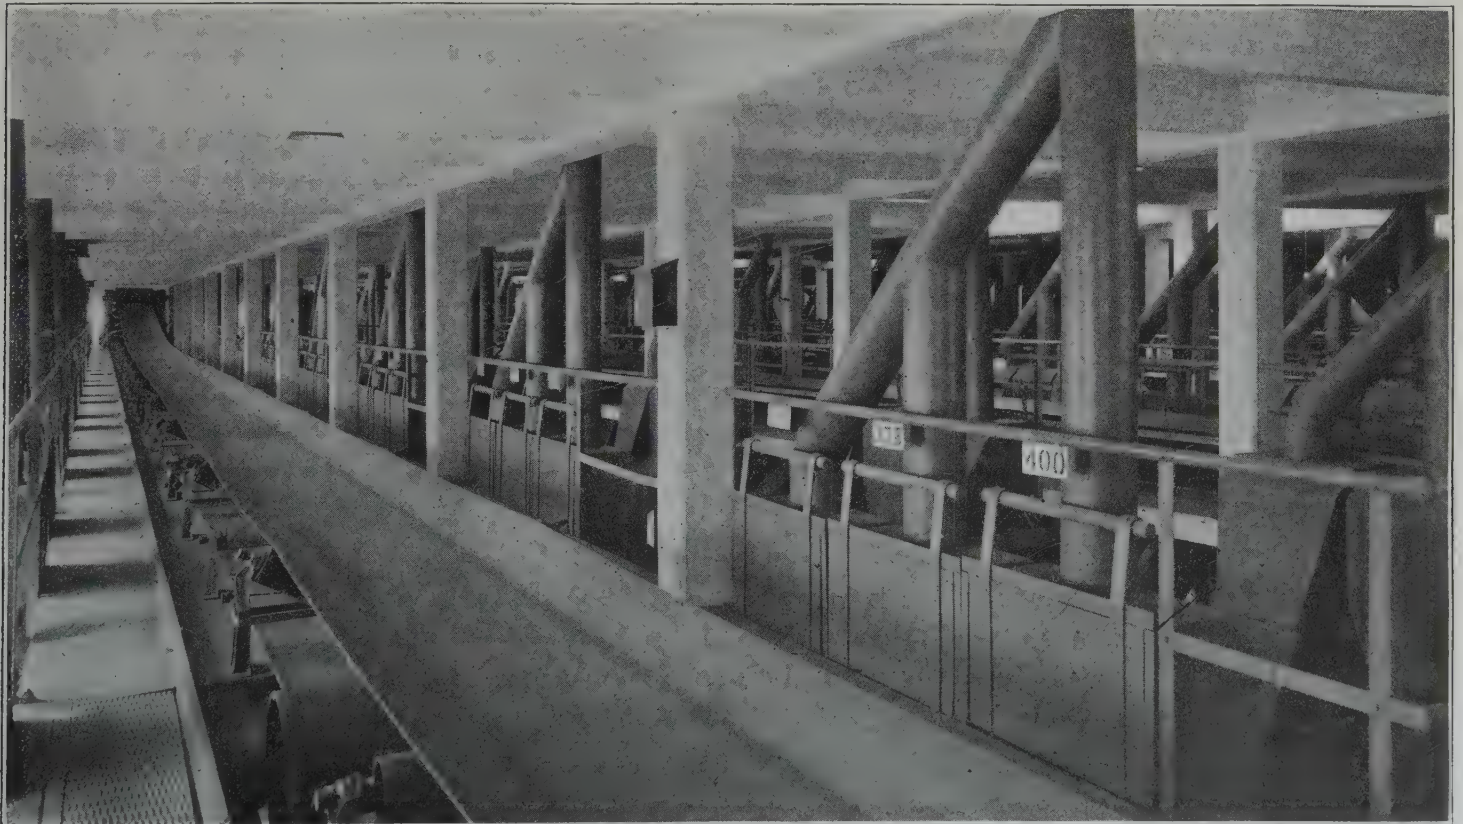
B. & O. Elevator. Cupola of Storage Annex Showing One of the Ten 48-Inch Belt Conveyors from Which Grain Is Tripped to Fixed Spouting at Sides. Note Large Vent Pipes Extending from Spouts Out Through Roof. (See illustration on facing page.)
